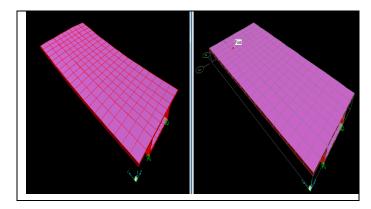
3D View of RC box girder bridge with zero degree skew angle
